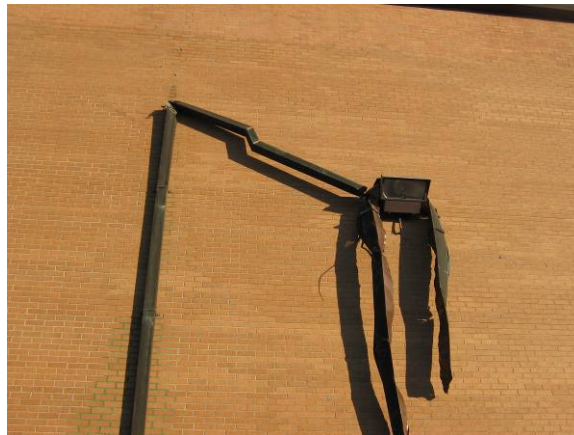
Missing Roll Up Door Photo 2—Damaged Down Spout
